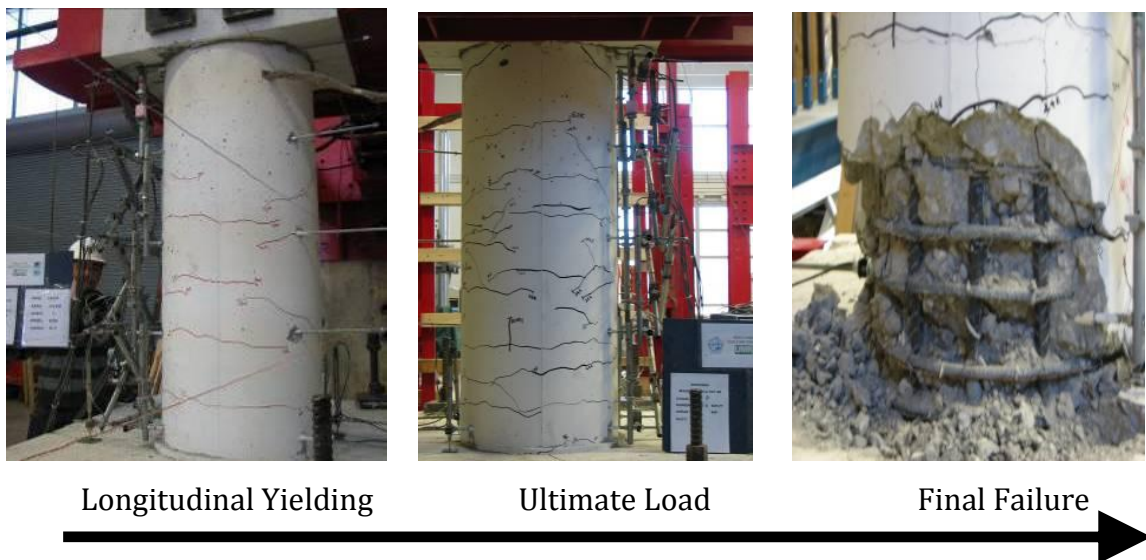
Damage of Column Missouri-H/D(3)-2.10%-1.32%-6.16%: under Flexure
